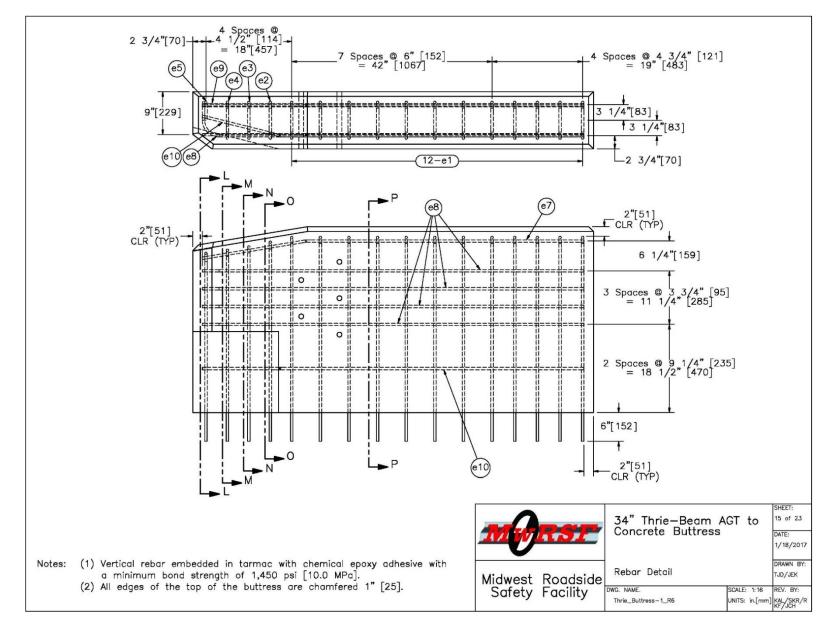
Rebar Detail, Test Nos. 34AGT-1 and 34AGT-2
